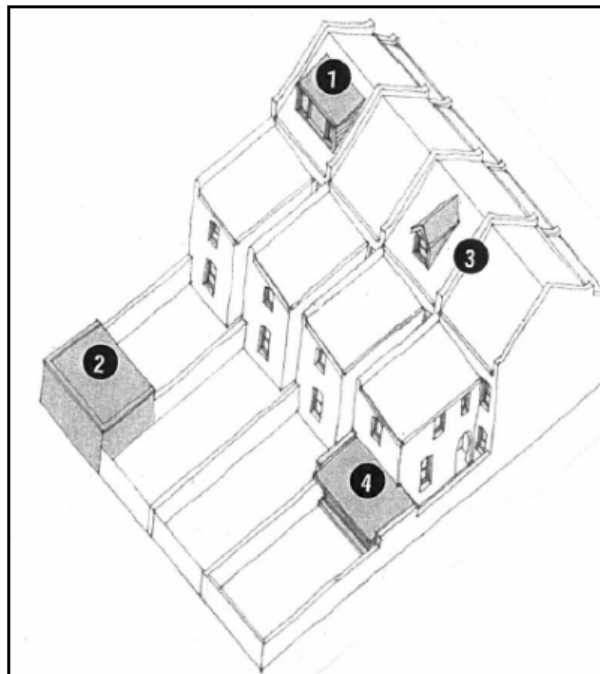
Two storey terrace design approach 1 showing the appropriateness of a skillion style dormer window and 2 storey addition
